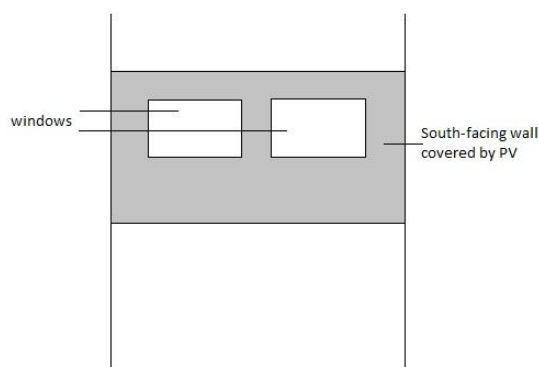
The office building as viewed from the front, i.e. towards the south-facing wall.
